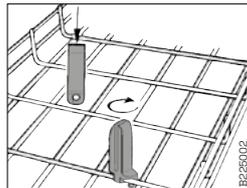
is used for mounting of Separating Plate B36 onto Mesh tray.
